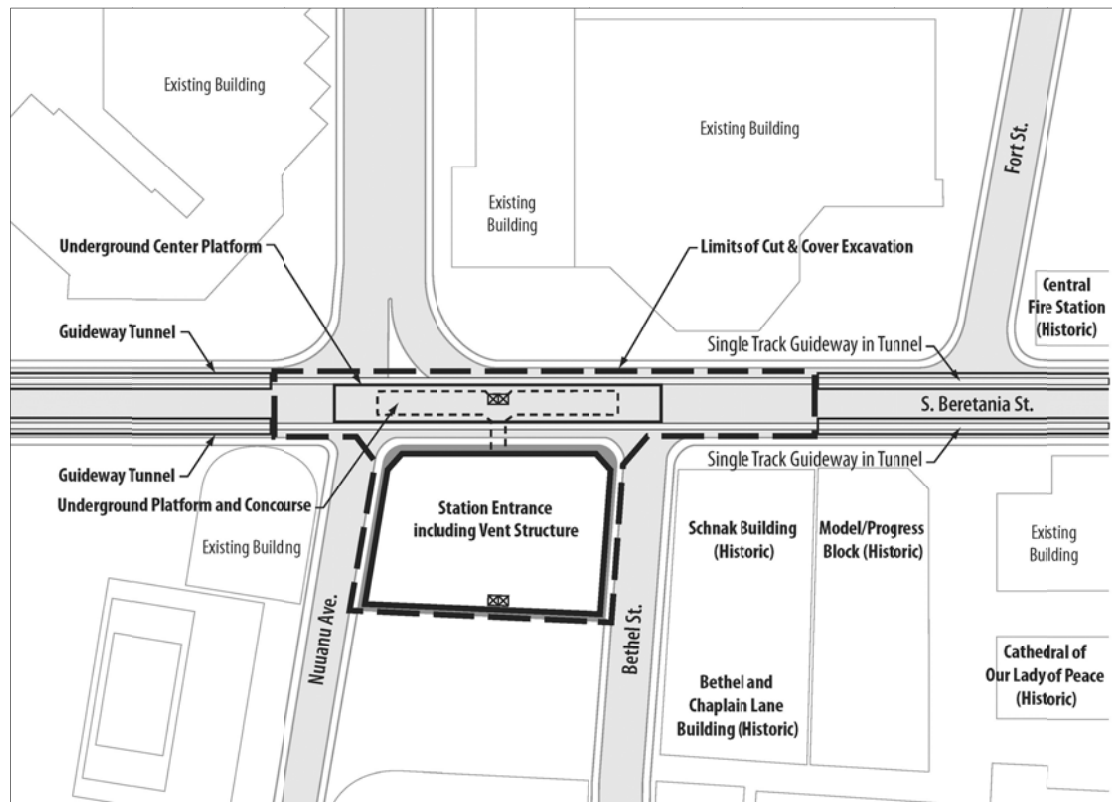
Beretania Street Tunnel Alternative Fort Street Station
